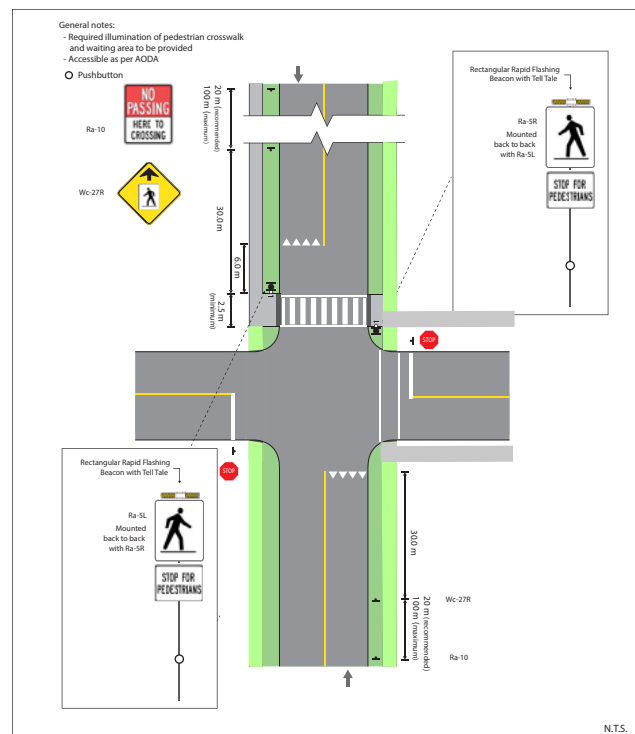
Crosswalk Detail-David Street West Intersection
